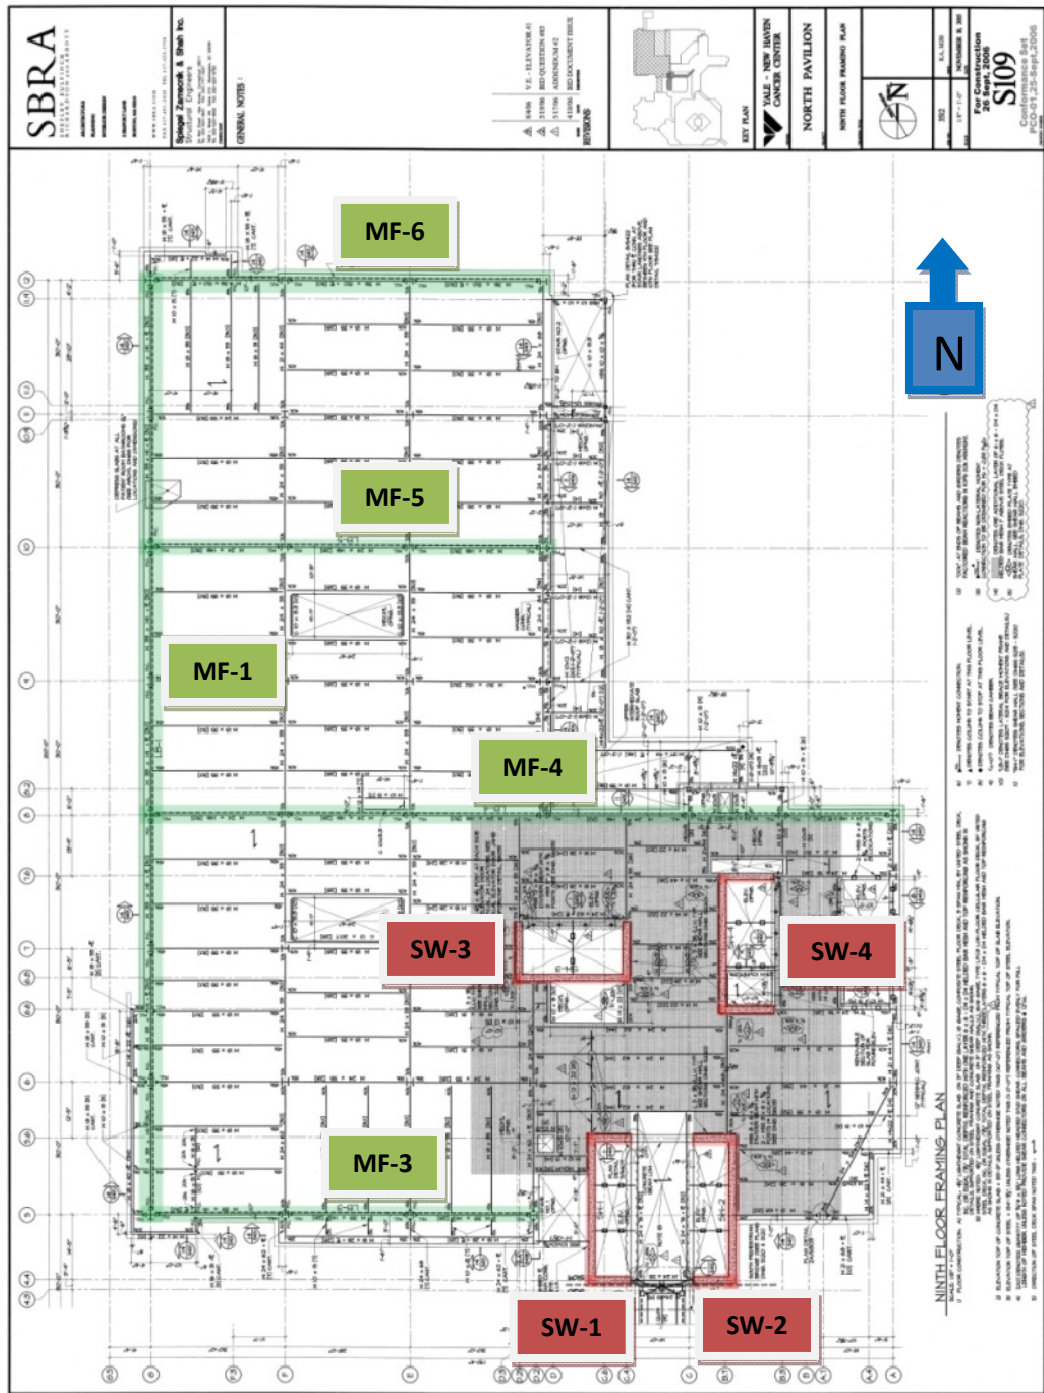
Typical Framing Plan for Levels 7-17. Green denotes Moment Frames; Red denotes Shear Walls.
